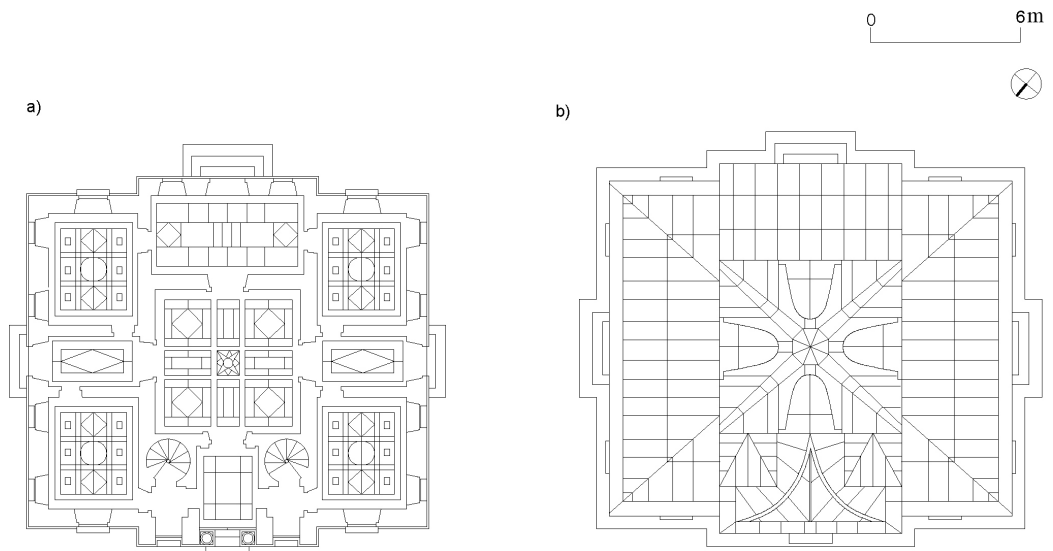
The Casita de Arriba, a) plan at 1.5m and b) roofs plan. Graphic elaboration by the authors.
